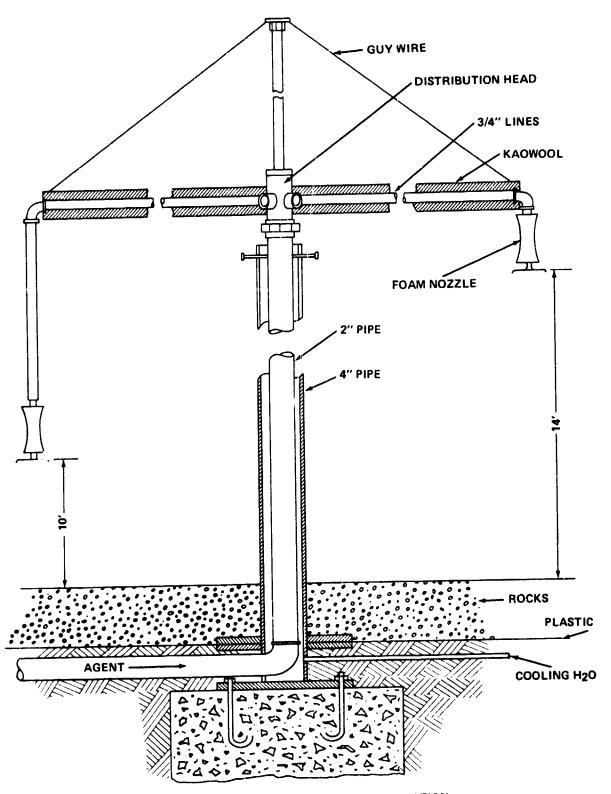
DETAILS OF FOAM TOWER CONSTRUCTION.
